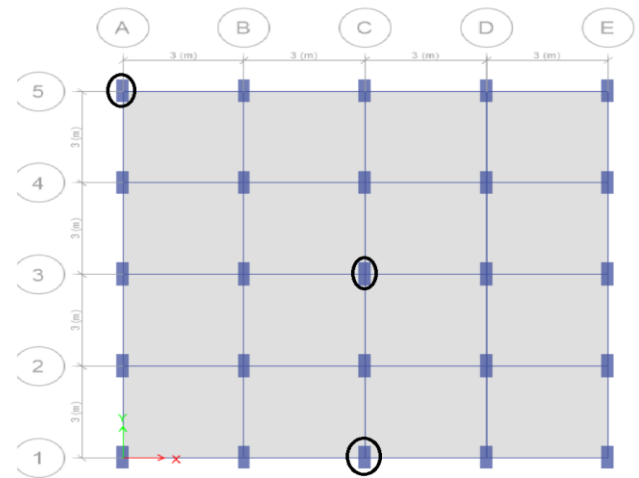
plan showing sudden loss of column layout of the building in ETABS 2016
